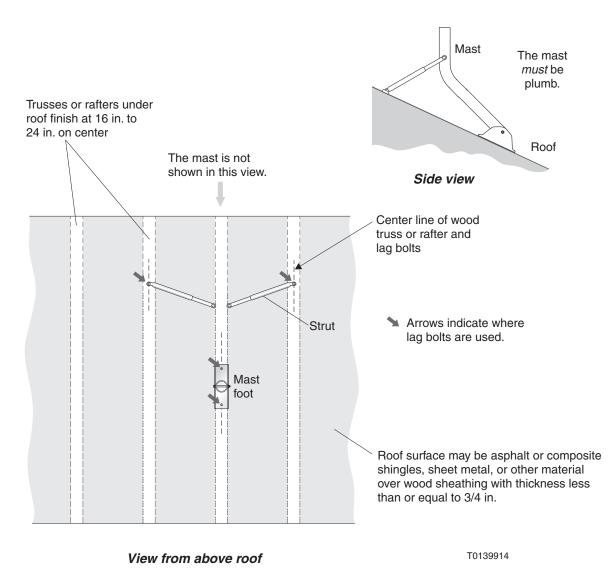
illustrates a typical trimast installation on a wood-frame roof.
